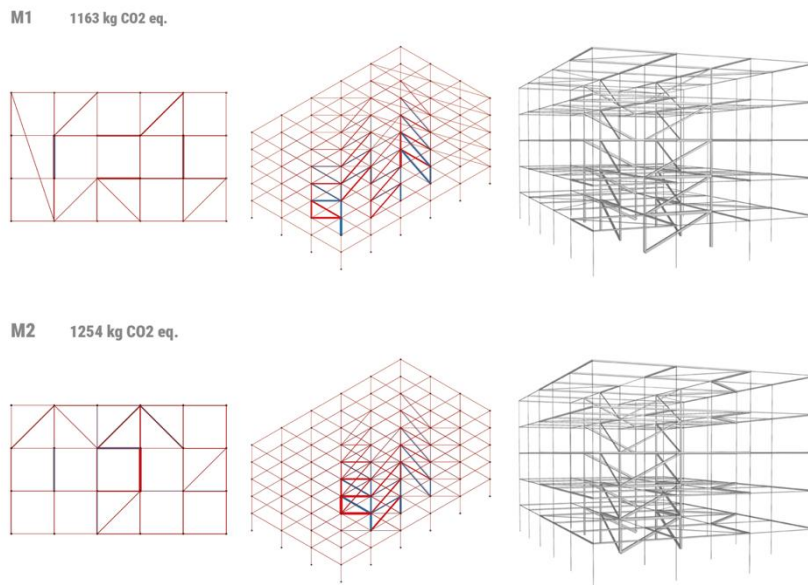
Plan, isometric and two-point perspective views of the bracing models M1 (open core) and M2 (central core)
